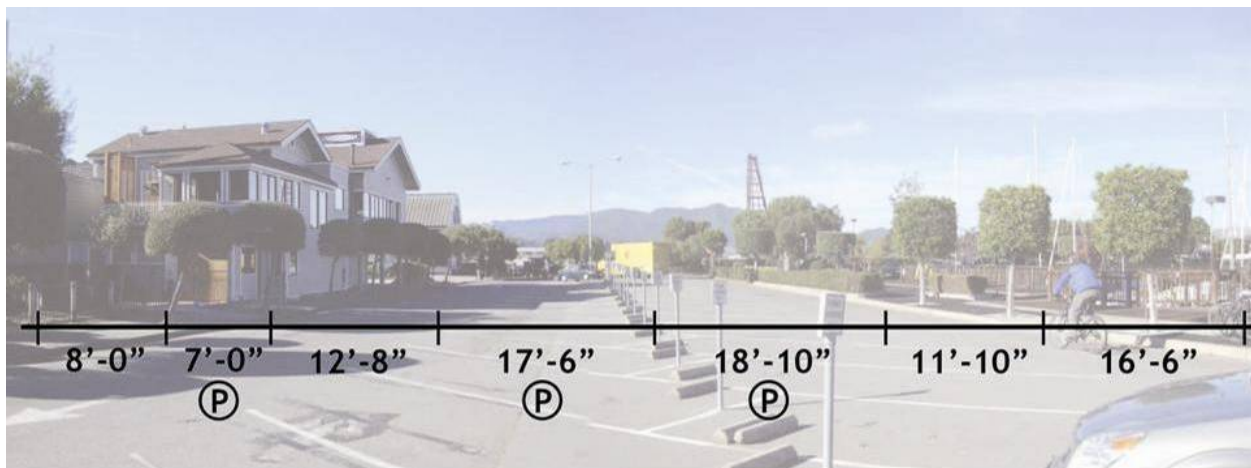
Segment 1F Parking Lot 4 North Existing Conditions
